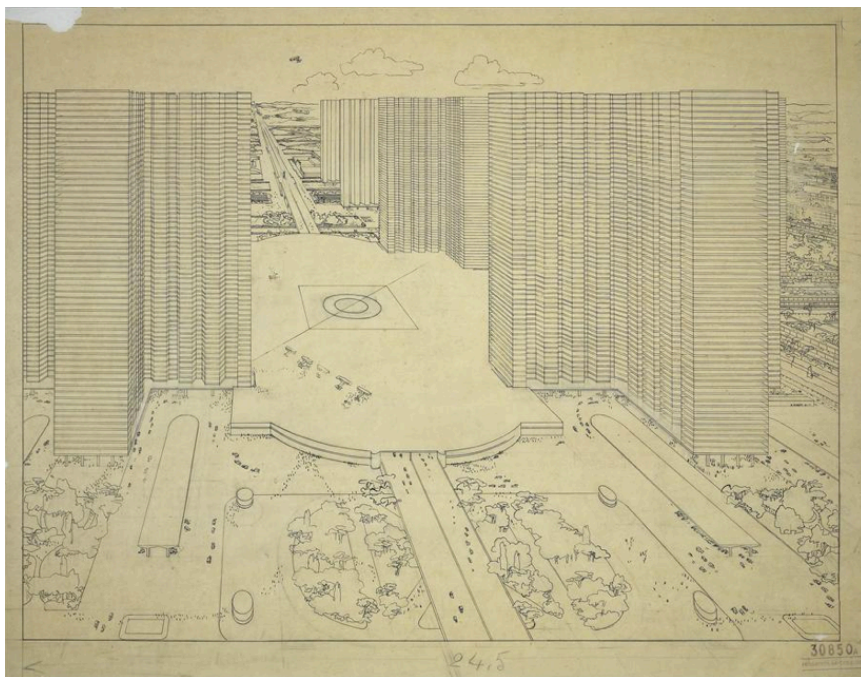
Architects drawing for Plan Voisin (Fondation Le Corbusier)
